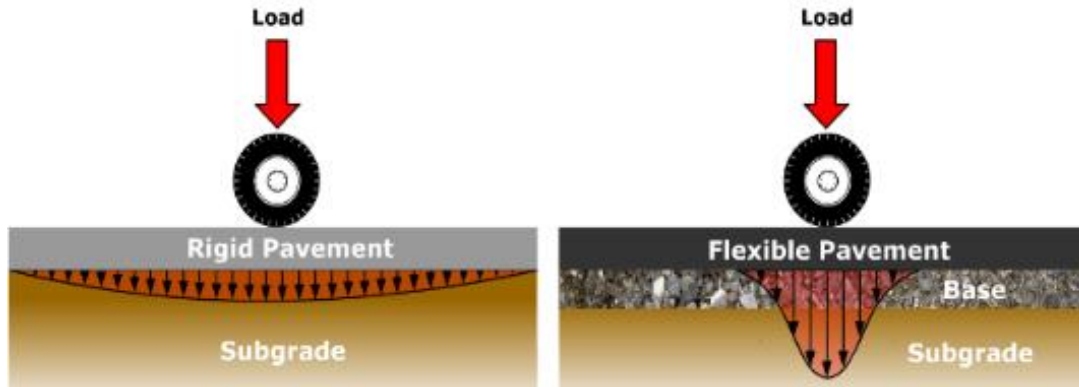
Load Distribution of Flexible and Rigid Pavement (Muench et al., 2003)
